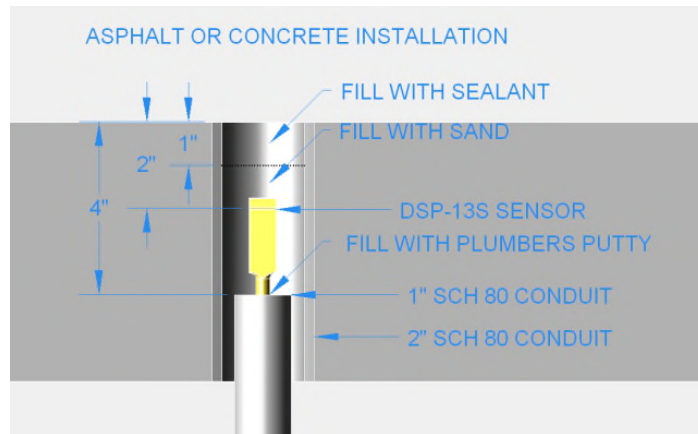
Sensor Installation – Conduit Under Asphalt or Concrete
